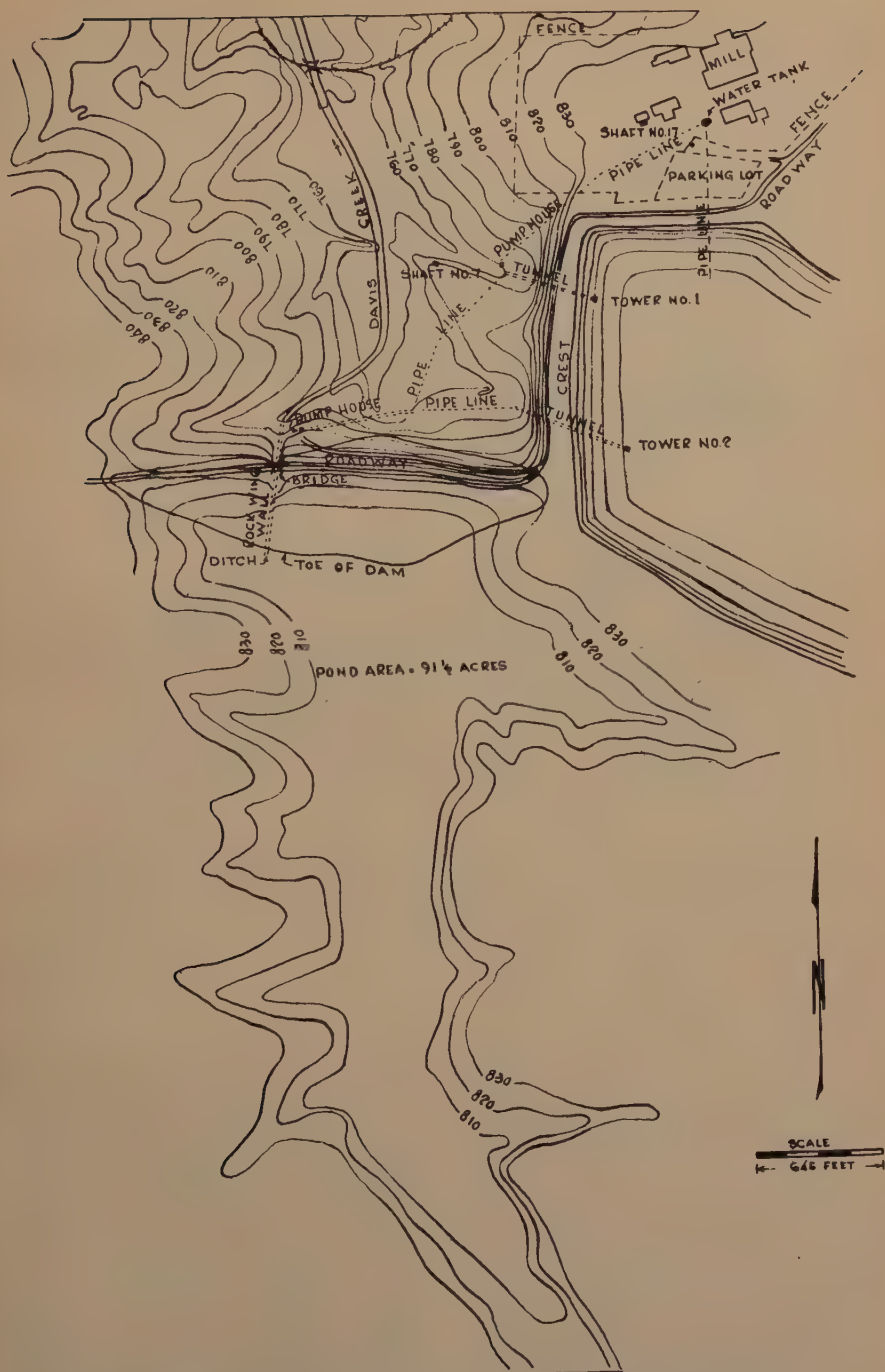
DAVIS CREEK SLIME POND AFTER BUILDING OF DAM.
